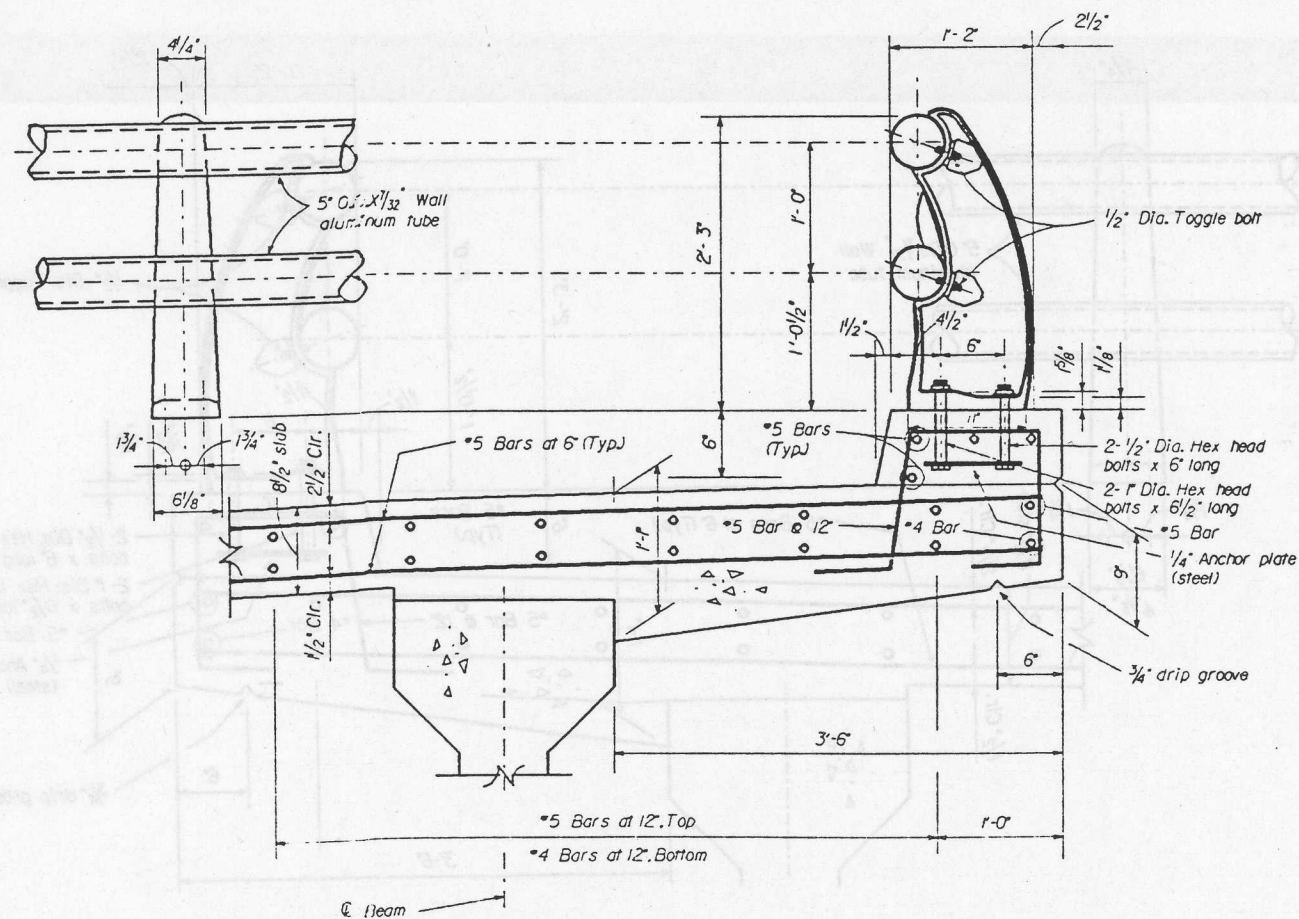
Design Details of the Foothills Parkway Bridge Rail for Test FPAR-2
